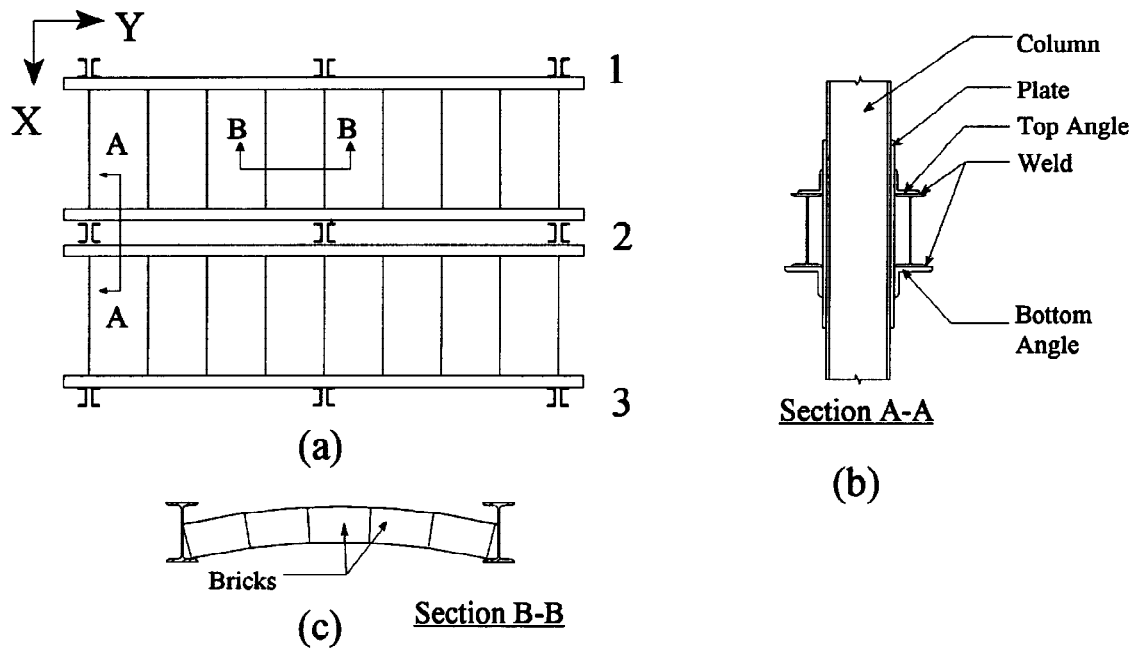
(a) Floor plan, (b) beam-to-column connection, and (c) jack-arch floors of typical steel structures of Iran
